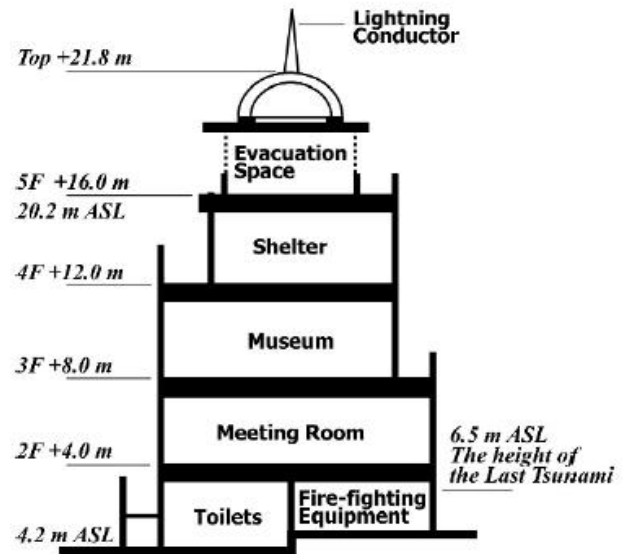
Tsunami shelter in Japan: Nishiki Tower and its cross- section, from Nakaseko, 2008.
